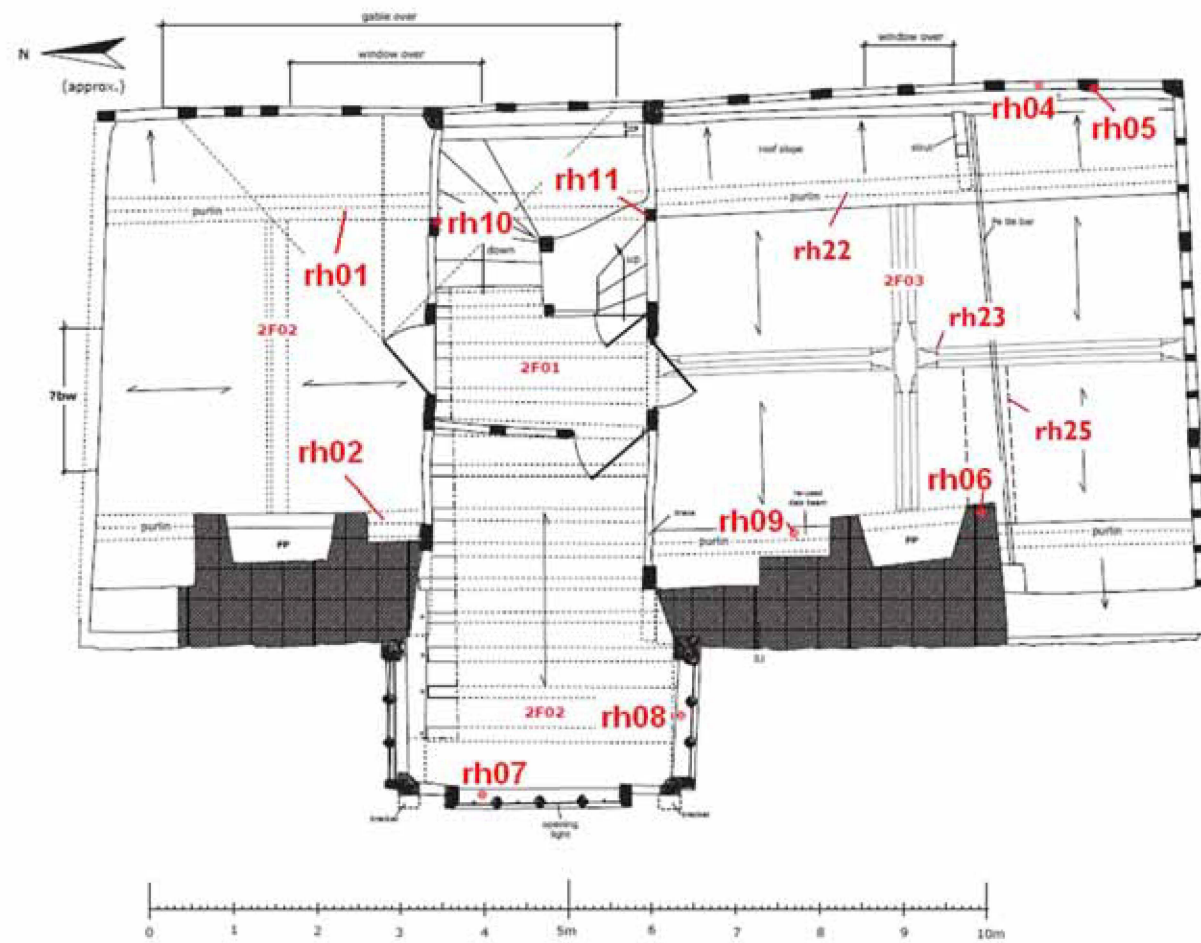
Second-floor plan, showing timbers sampled for dendrochronology (after Tyler).
